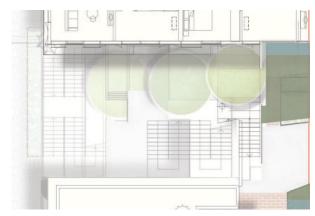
indicative planting for Outer Circle Paper Trail stairs as shown on landscape plans.
